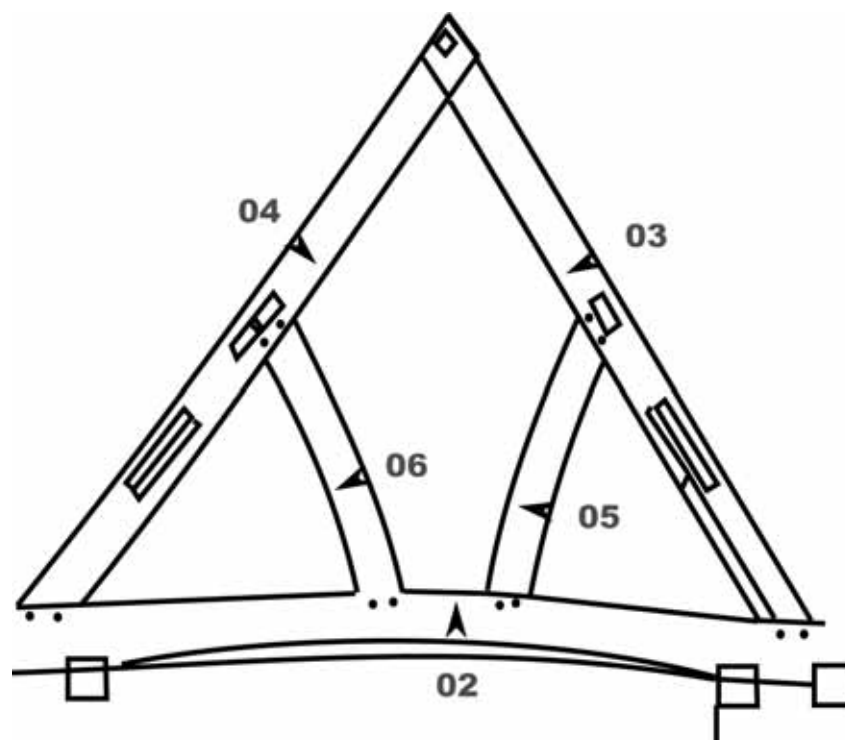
St Mary's Church, truss 3 east face, showing the location of samples SAR-A02–06
